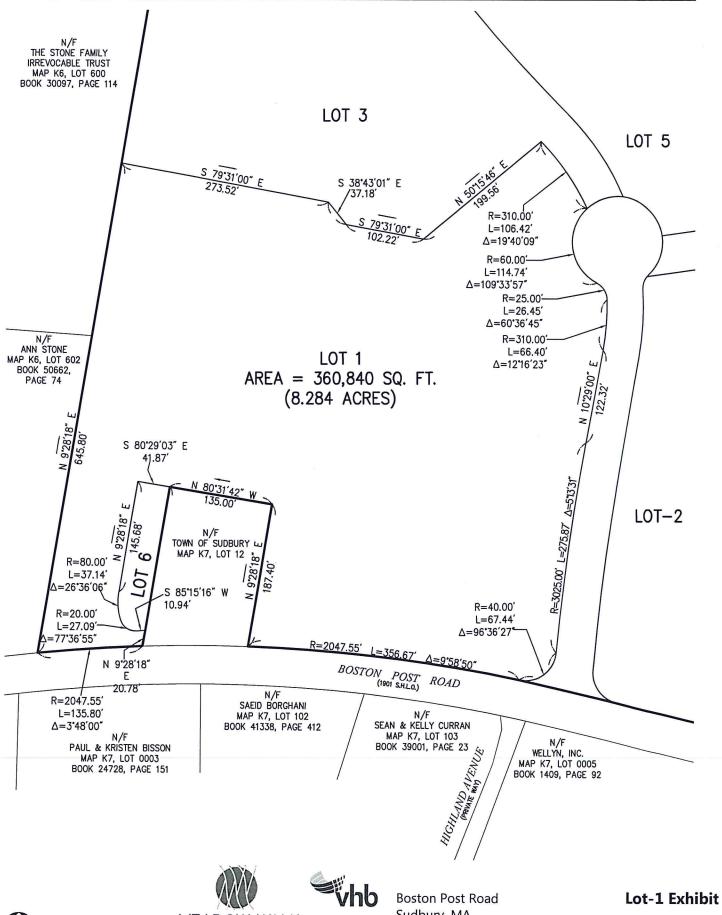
EXHIBIT B Land/Easement Conveyance Plan for Future Fire Station
